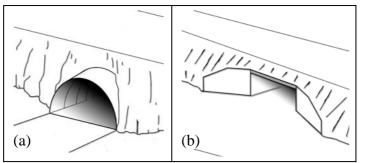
Basic design of common underpasses (a) tunnel and (b) box culvert.
